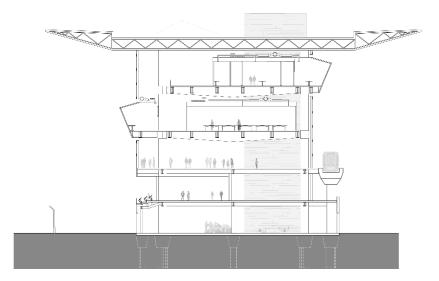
Building Section 2 (Source: Created By Author Nicholas DiBella)
